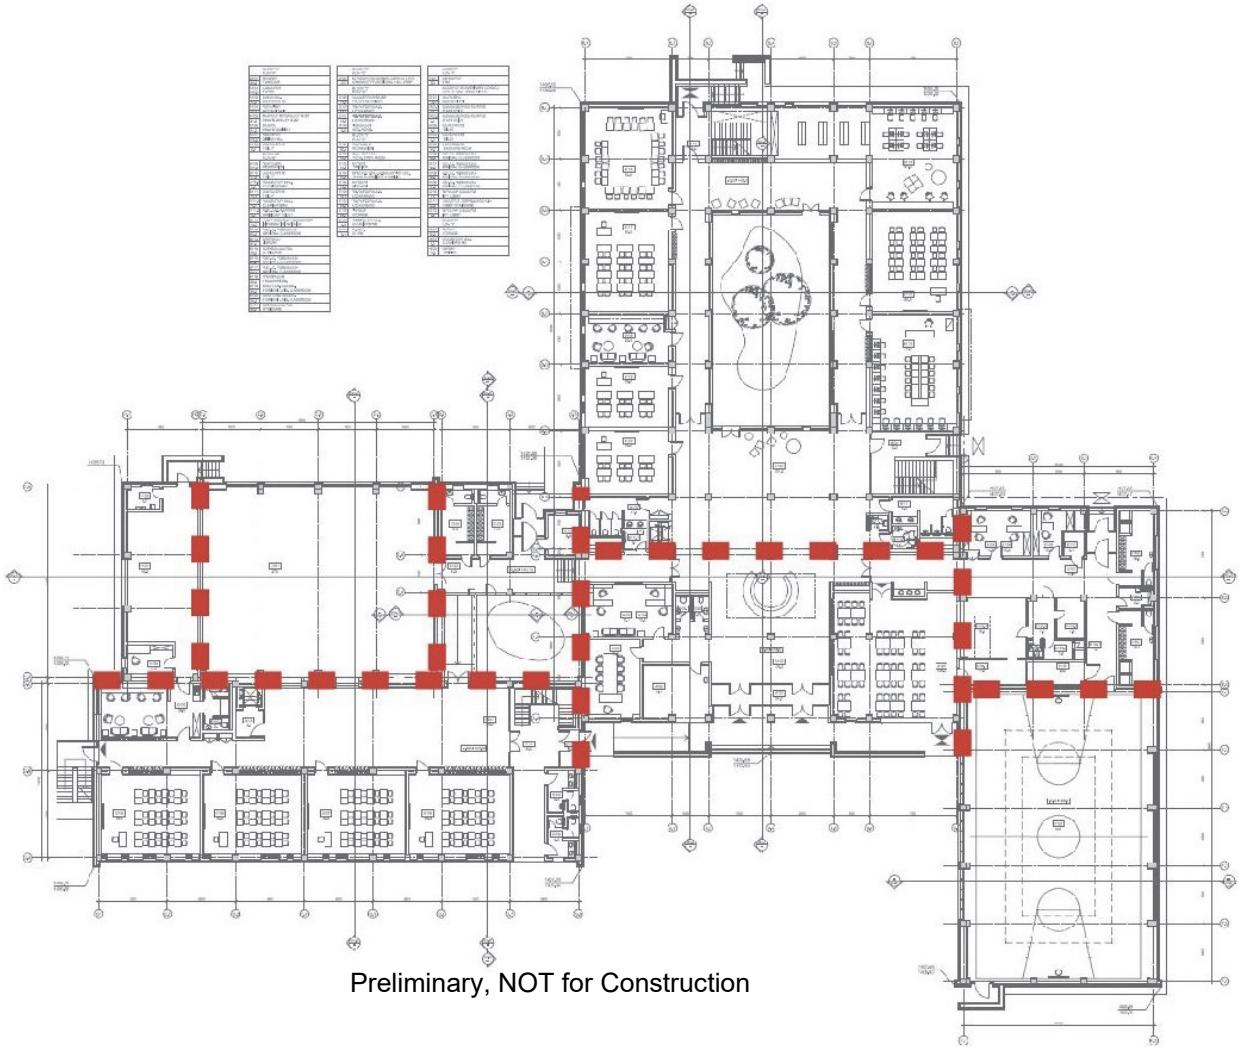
Ground floor plan of UNDP prototypical new school. Dashed lines indicate locations of anti-seismic joints for structural separation between modules.
